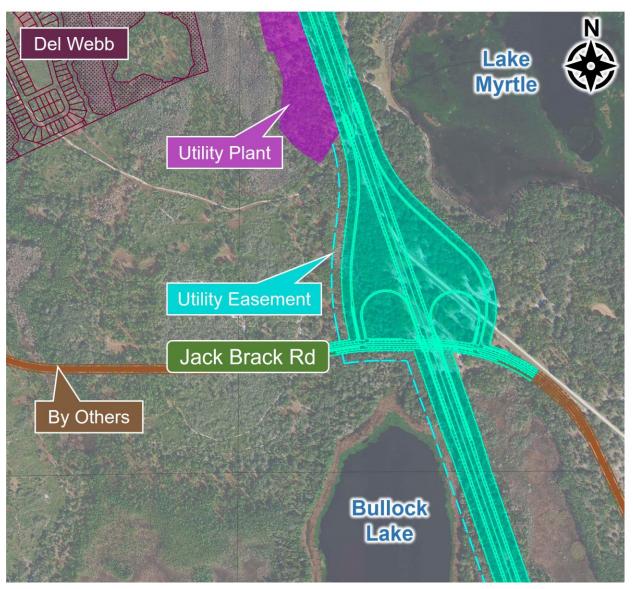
PAR-CLO Concept at Jack Brack Road
